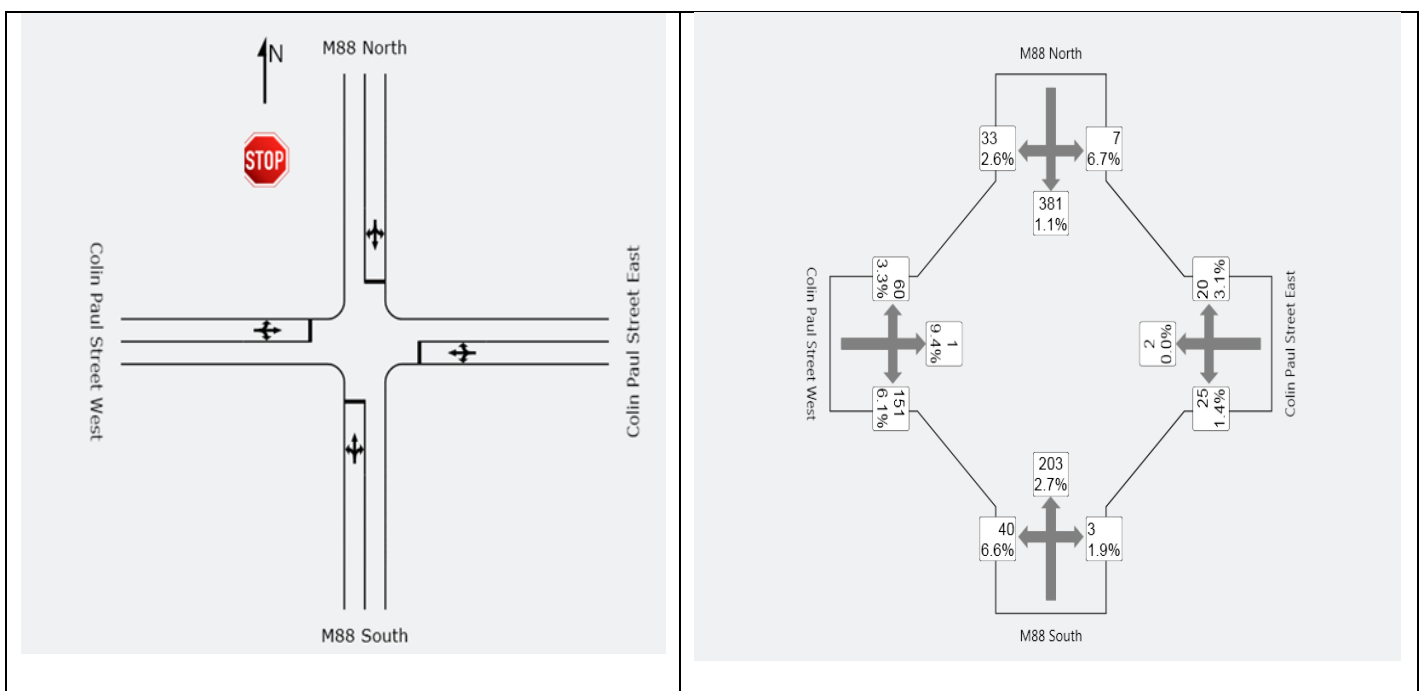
All way stop intersection layout of Colin Paul Street and M88 ( Rienert Avenue)
